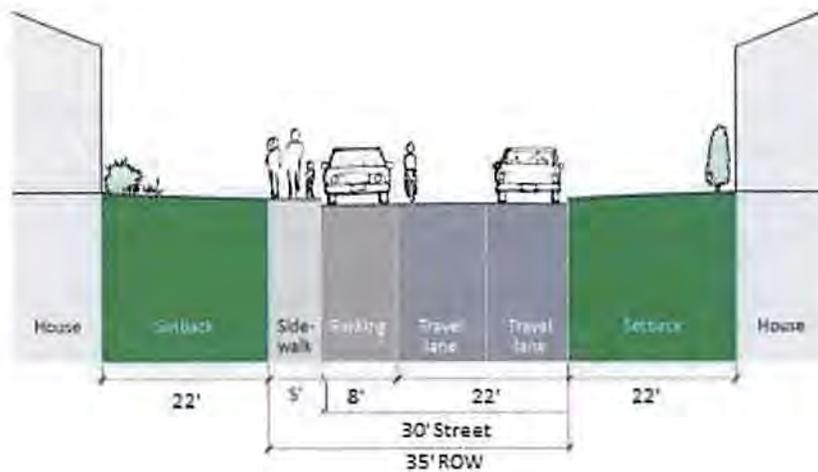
(B)-2: Cross-sections for local access street design options (with standard dimensions)
